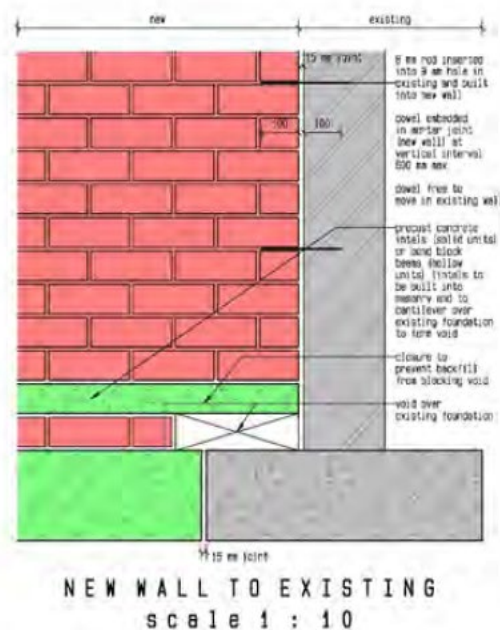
Drawing Regarding Detail of Windows, Roof and Foundation of the Extension on the Cape Dutch House
